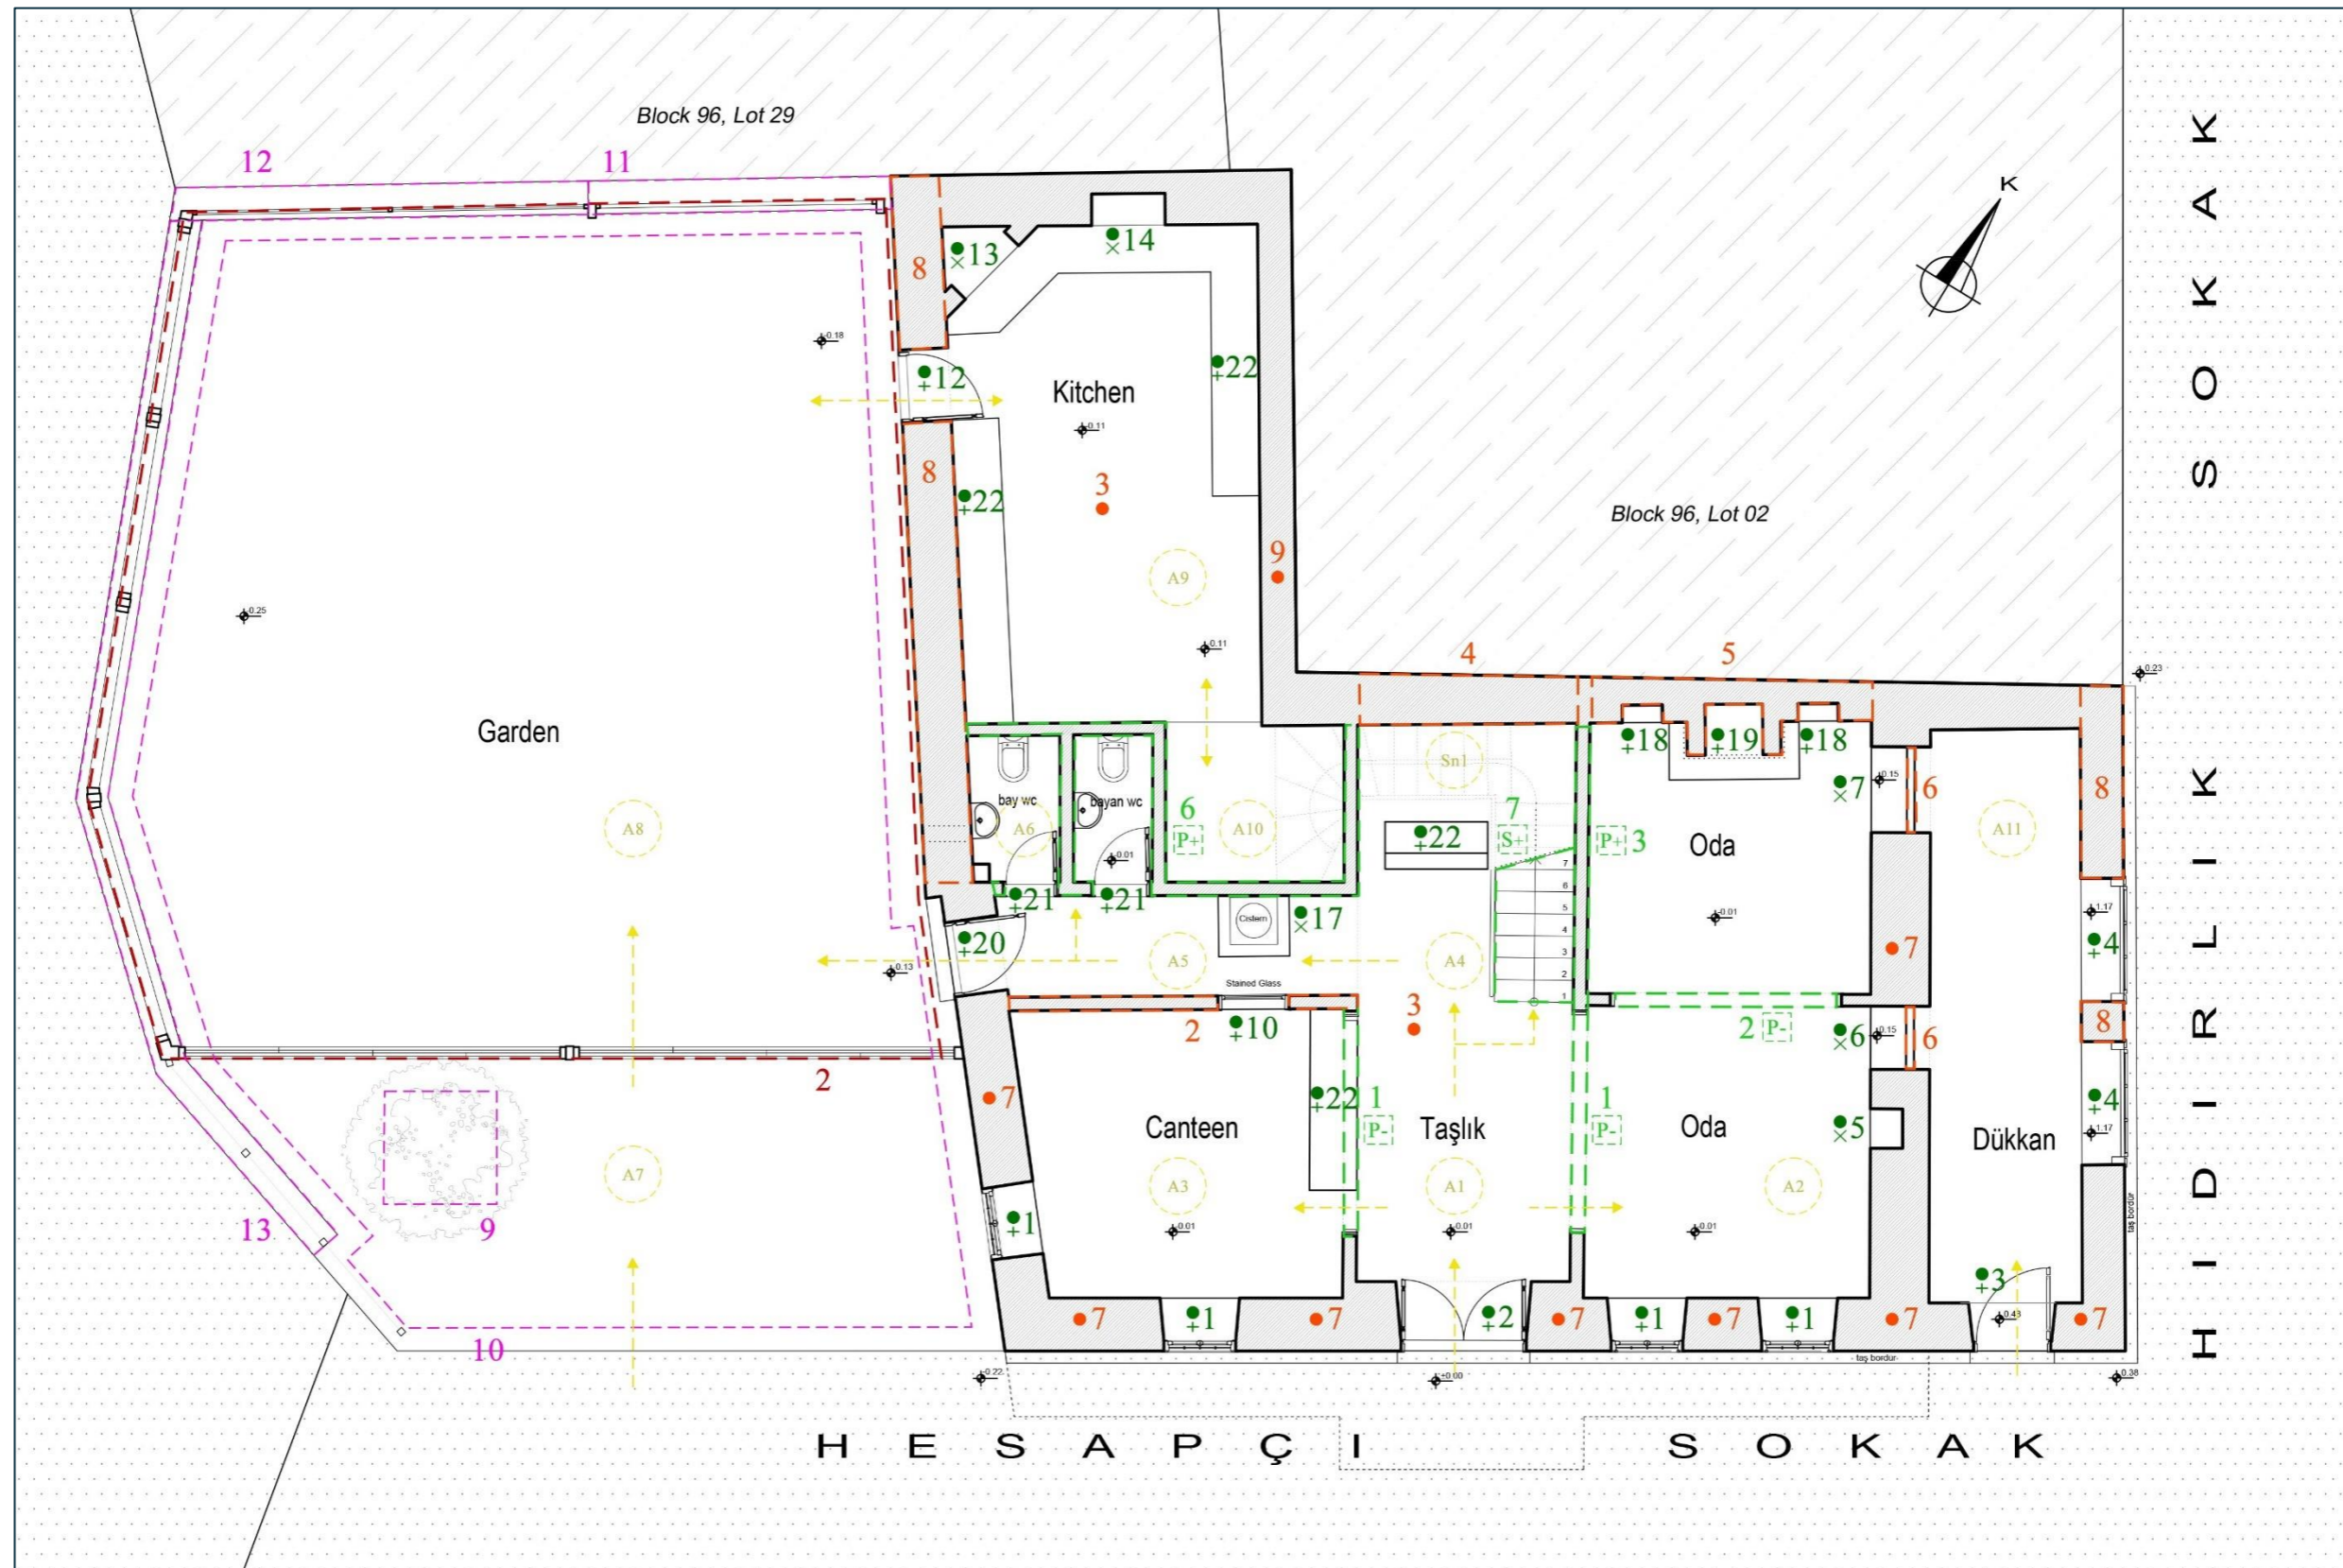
Restored ground floor intervention analysis plan of Building A. Prepared by the Author.
